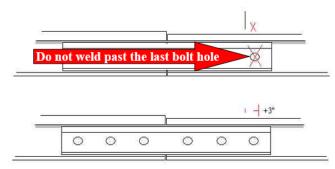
Limits of Rail End Weld Build-up
